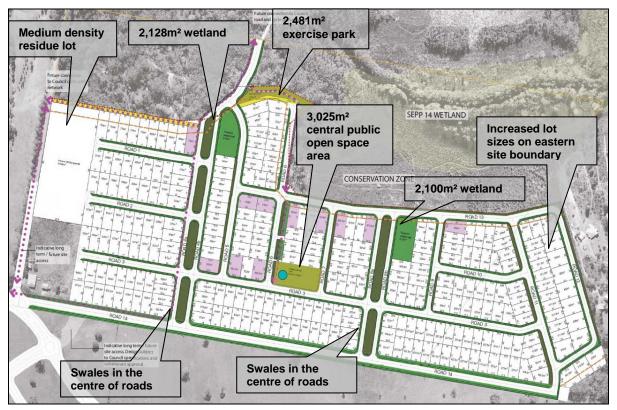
Proposed Subdivision Layout (source: Preferred Project Report)
